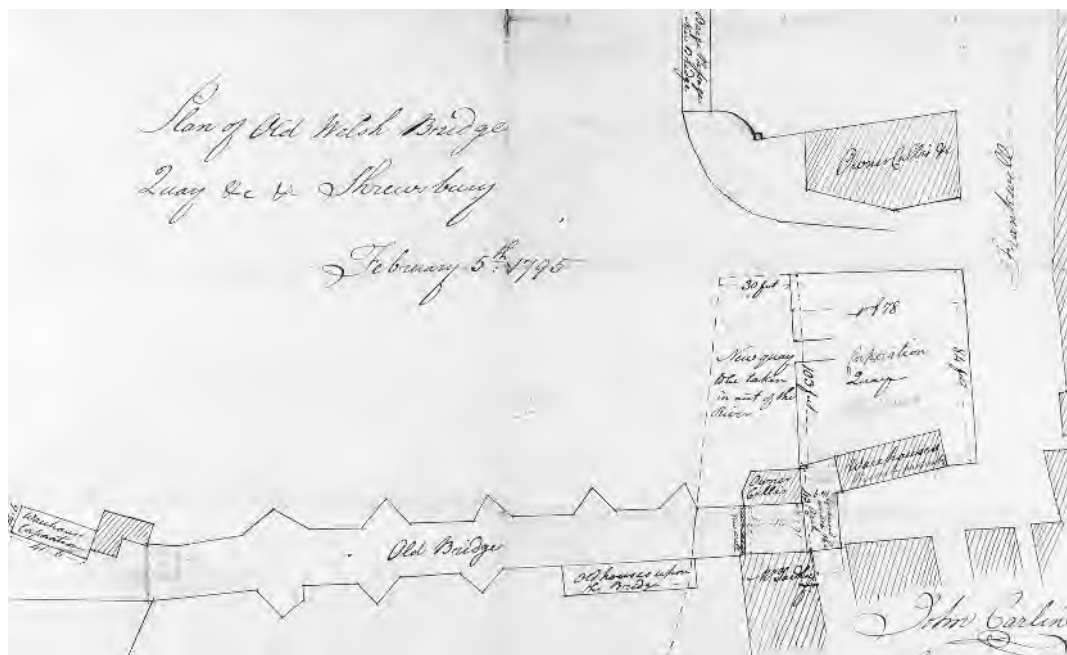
Carline and Simpson plan, 1795, of the northern end of the old Welsh Bridge, showing the intended position of the new blocking wall on the bridge roadway and the proposed area of the new quay on the western side of the bridge; north is to the right (SA, 7112; with permission of Shropshire Archives)
